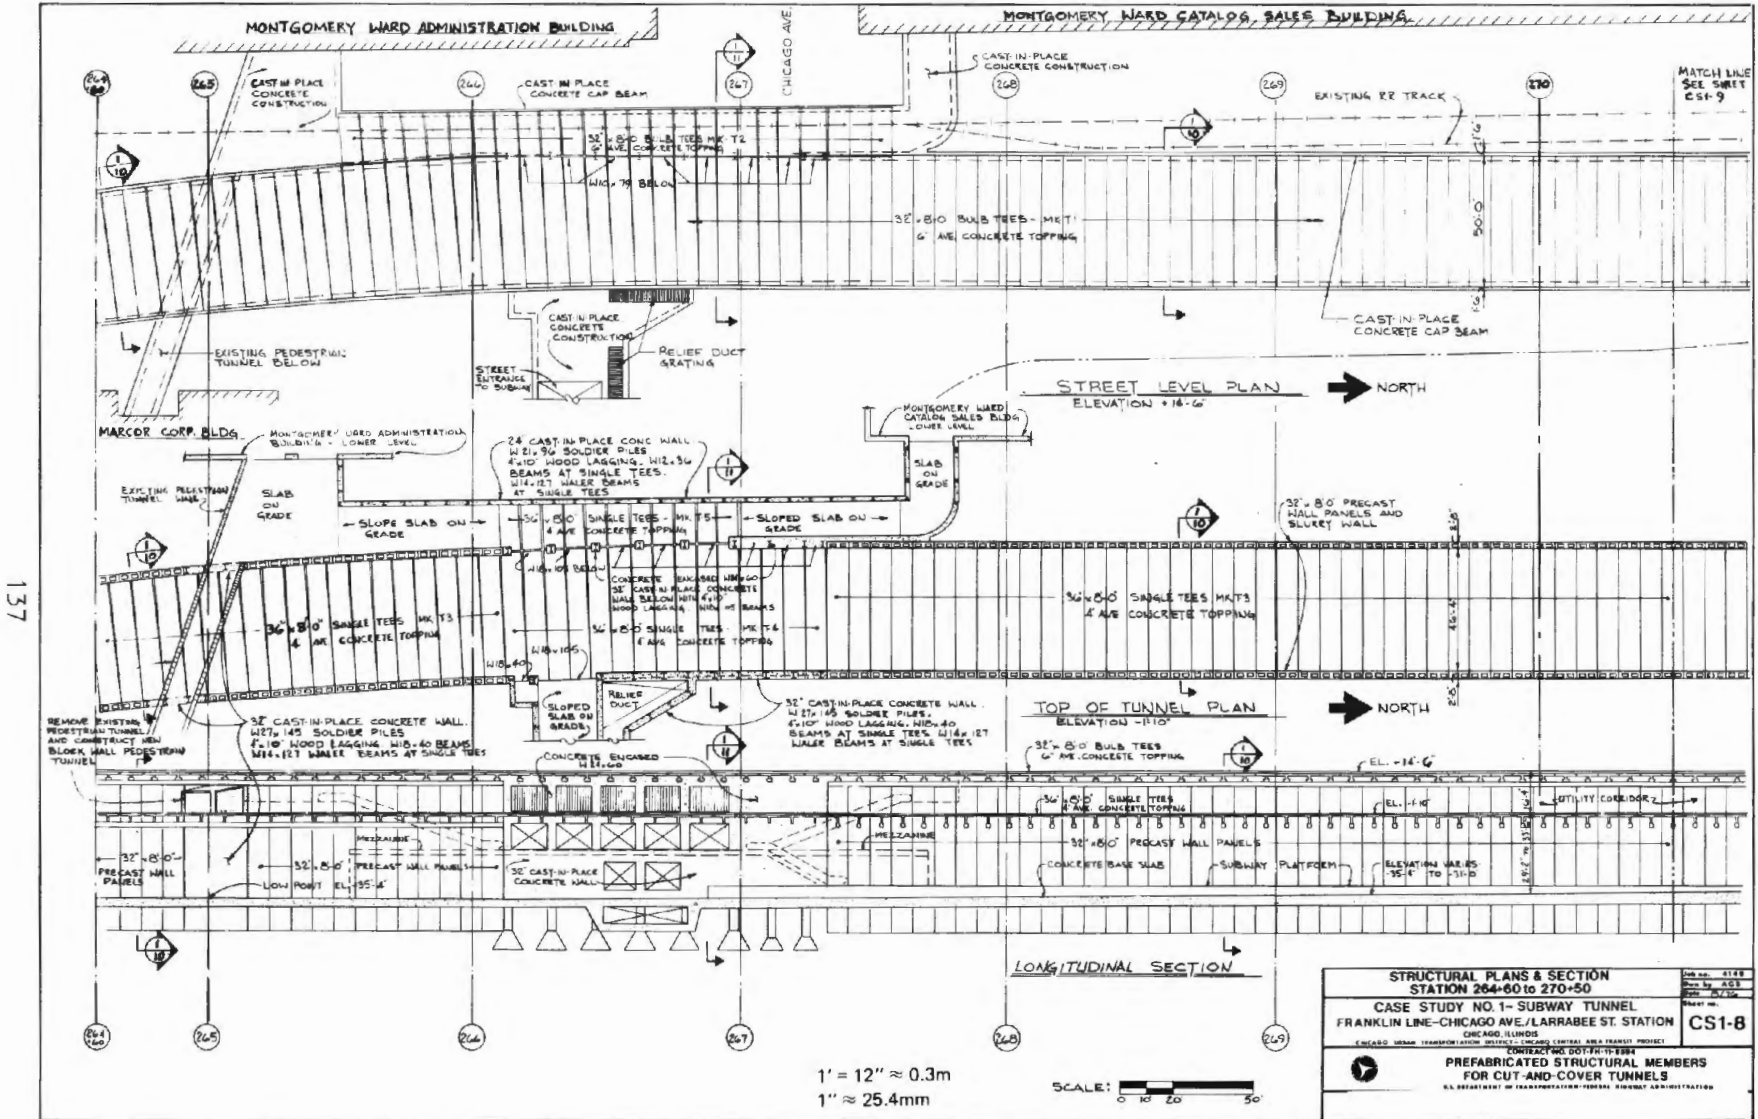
Case Study 1: Structural plans & section - Station 264 + 60 to 270 + 50
